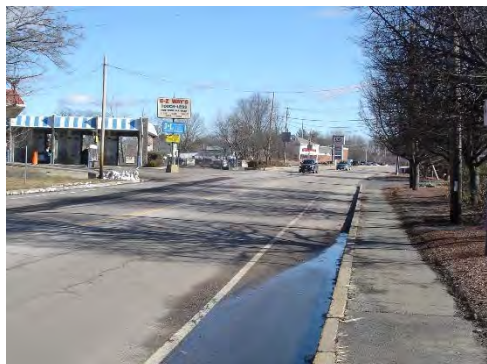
E-Z Way Carwash Driveway (left) and Five Guys Driveway (right) on Medway Road (Route 109)
